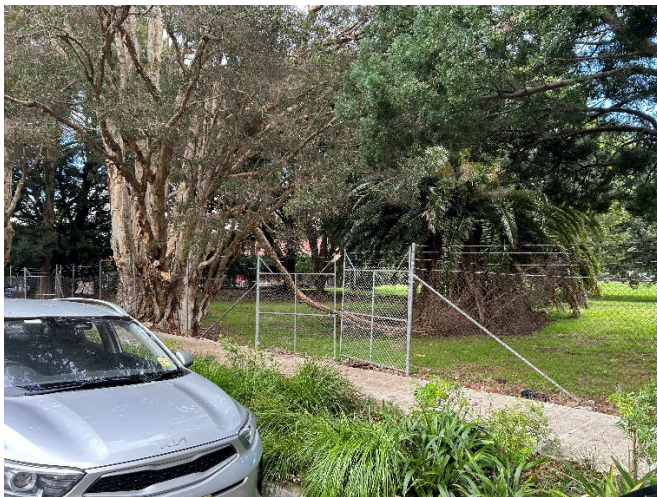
Existing perimeter fencing treatment throughout the vacant portion of the site
